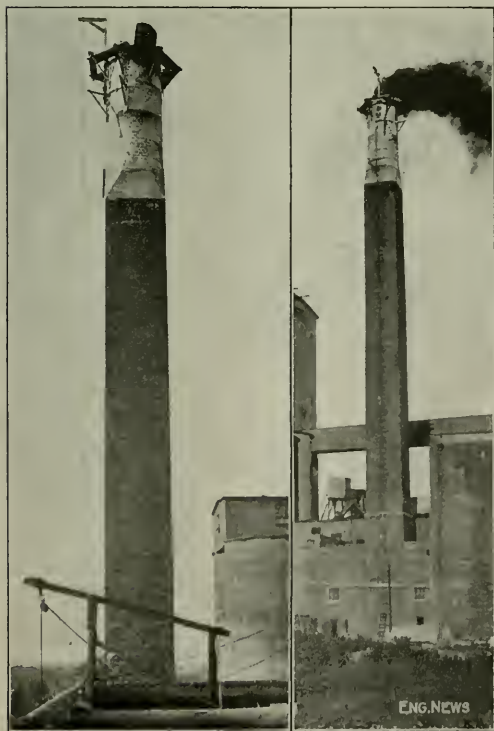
BUILDING A 30-FT. EXTENSION TO A BRICK CHIMNEY
